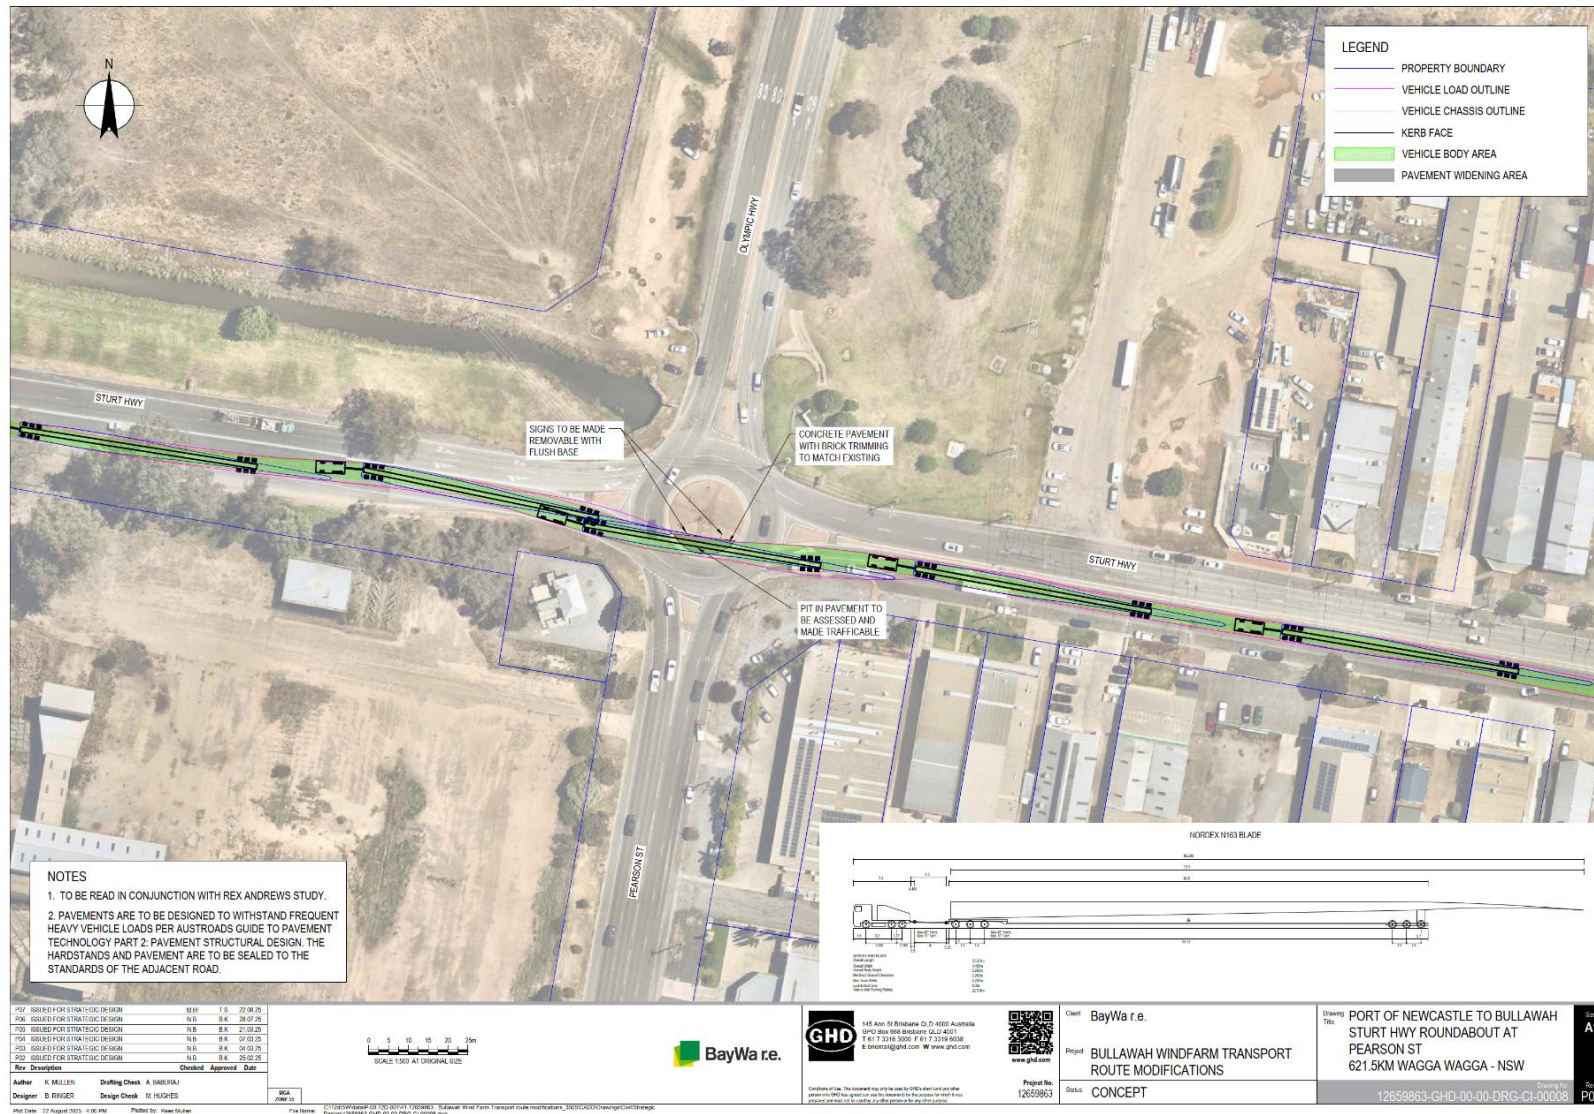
Roundabout at corner of Edward Street (Sturt Highway) and Pearson Street
